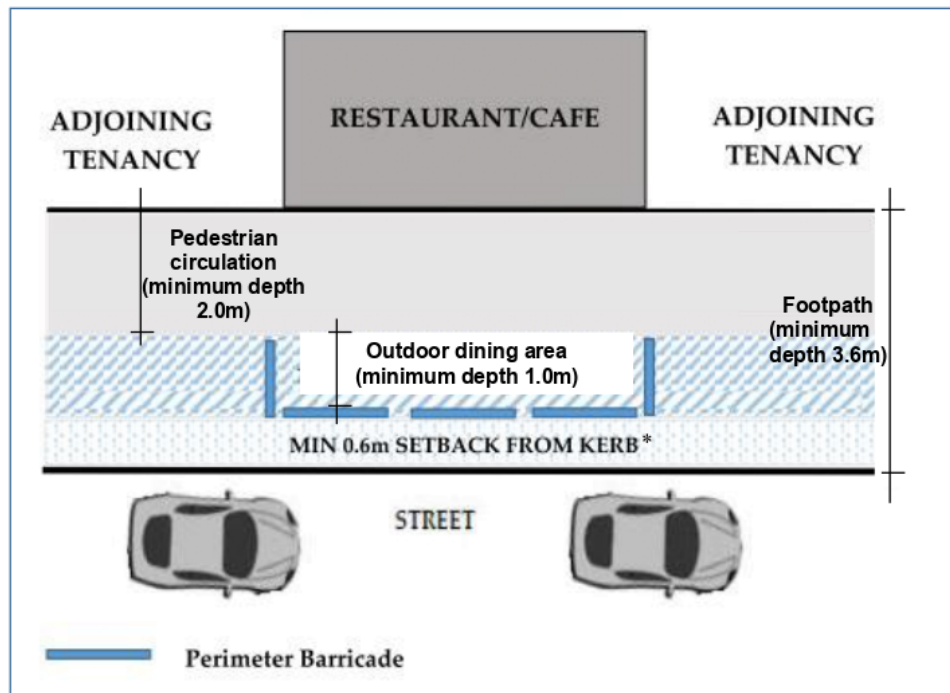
Minimum dimensions for outdoor dining on primary retail streets adjoining car parking
